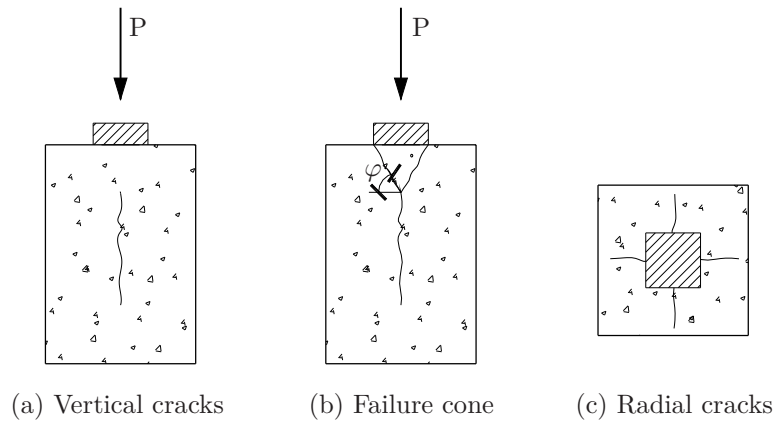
Failure mechanism in bearing tests of plain concrete blocks by Hawkins (1968b)
